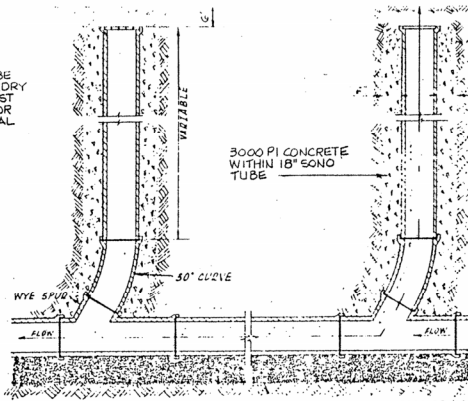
SINGLE PLAN AND CROSS SECTION-FULL LINE
